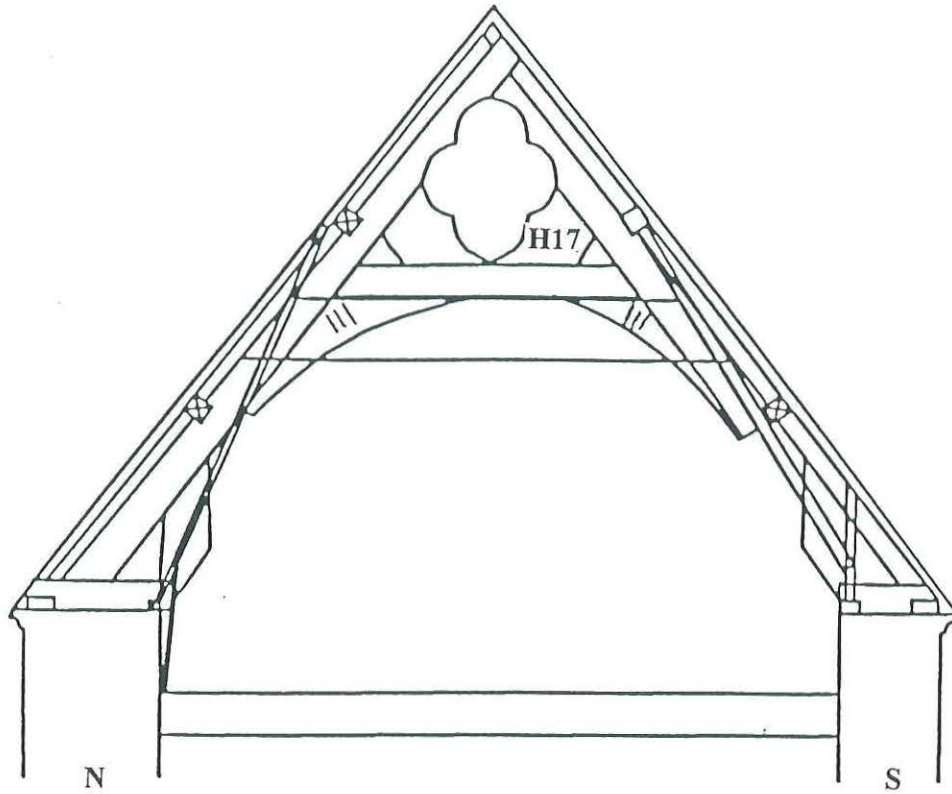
Drawing to show positions of samples from the trusses of the gatehouse roof
